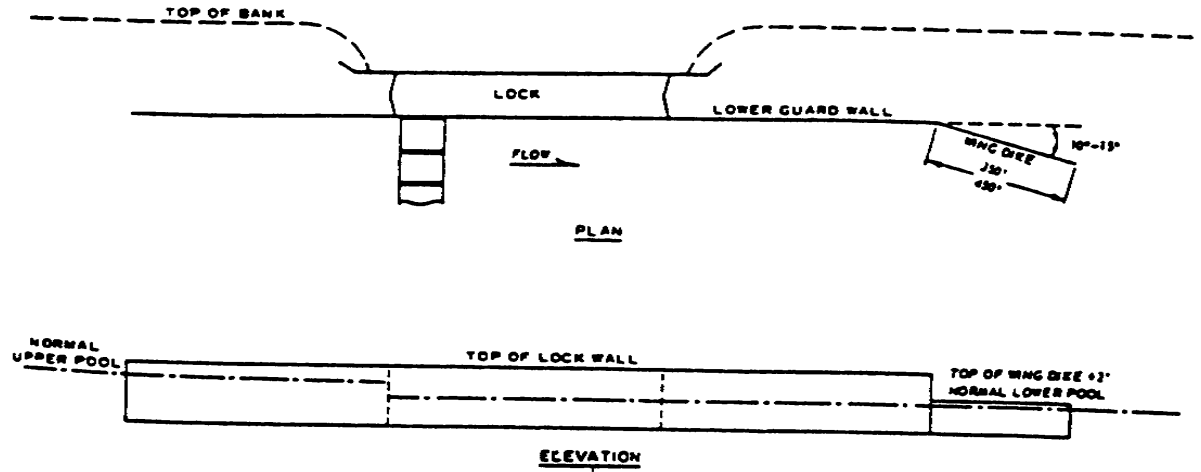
Wing Dike Used to Minimize Shoaling in Lower Lock Approach.
